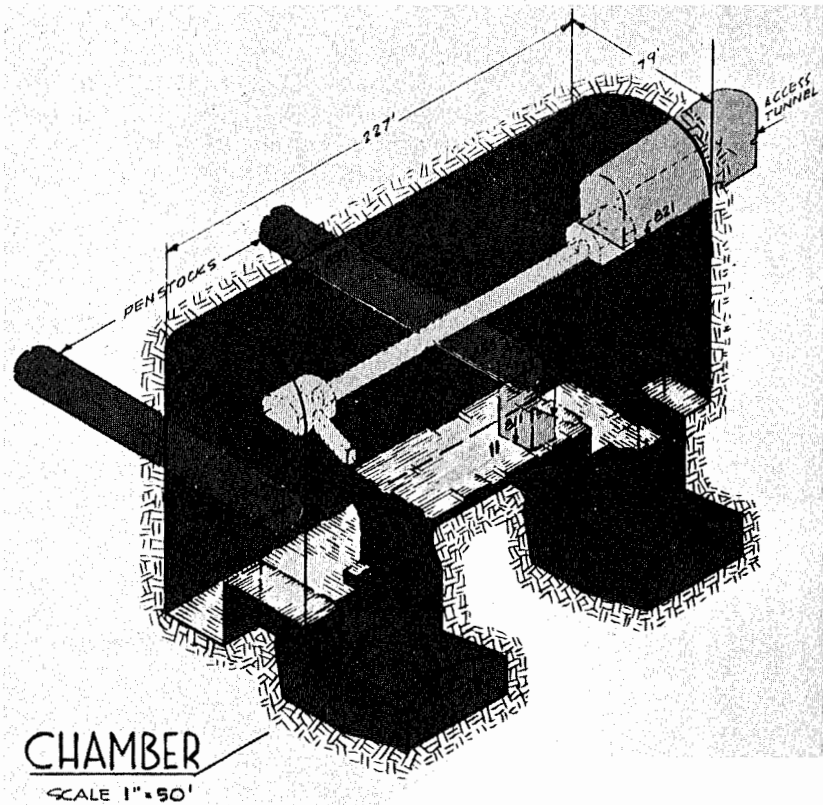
Excavation Diagram Underground Power Plant Chamber
